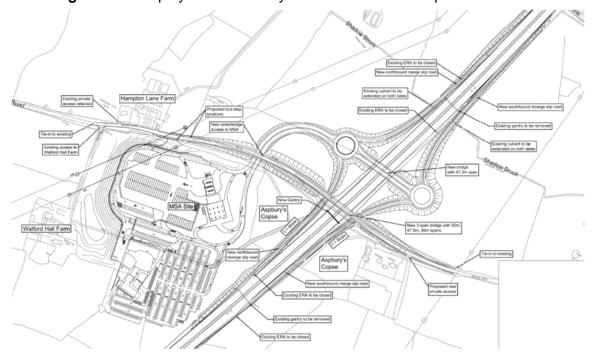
Outline Layout of the Proposed MSA Scheme Development Adjacent to the new Junction 5A
